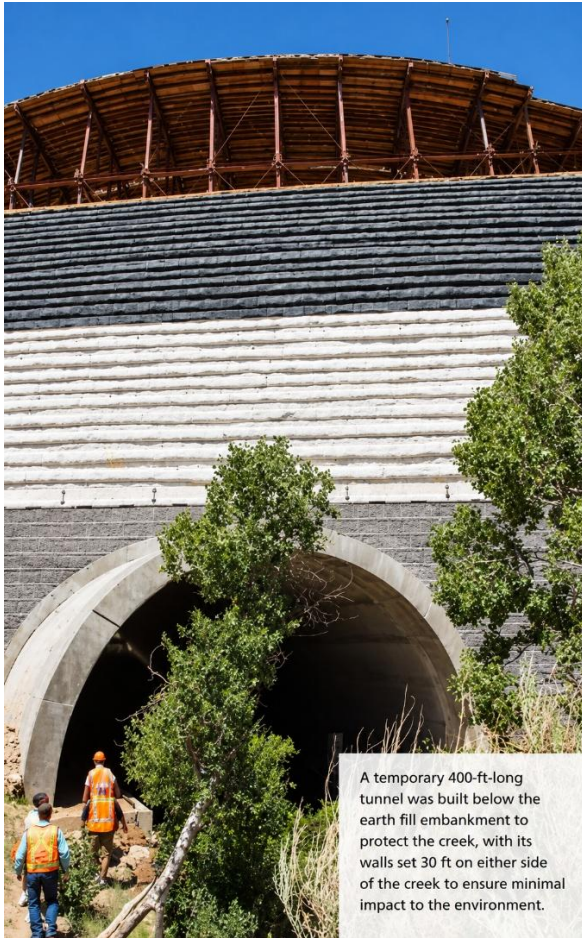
MSE/RSS wall, creek tunnel, and forms for the arch. (NDOT)
